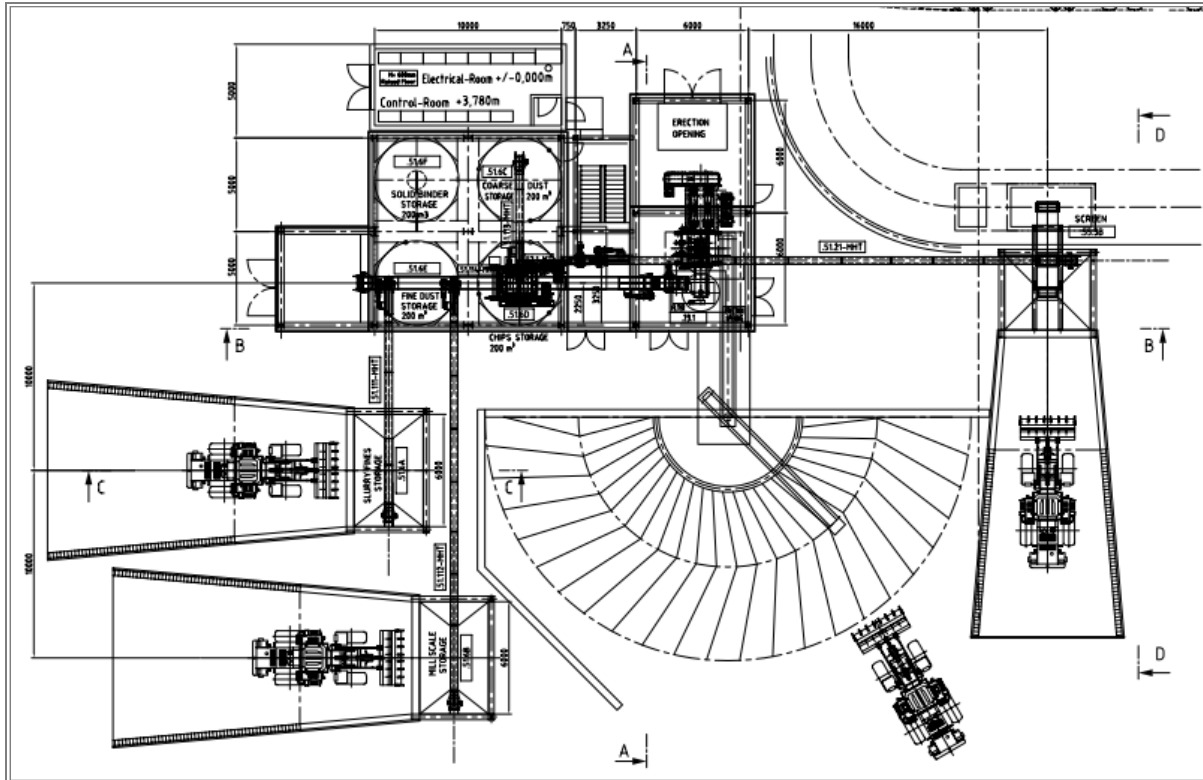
Typical plant layout of a 250,000 tons per year cold briquetting plant.
